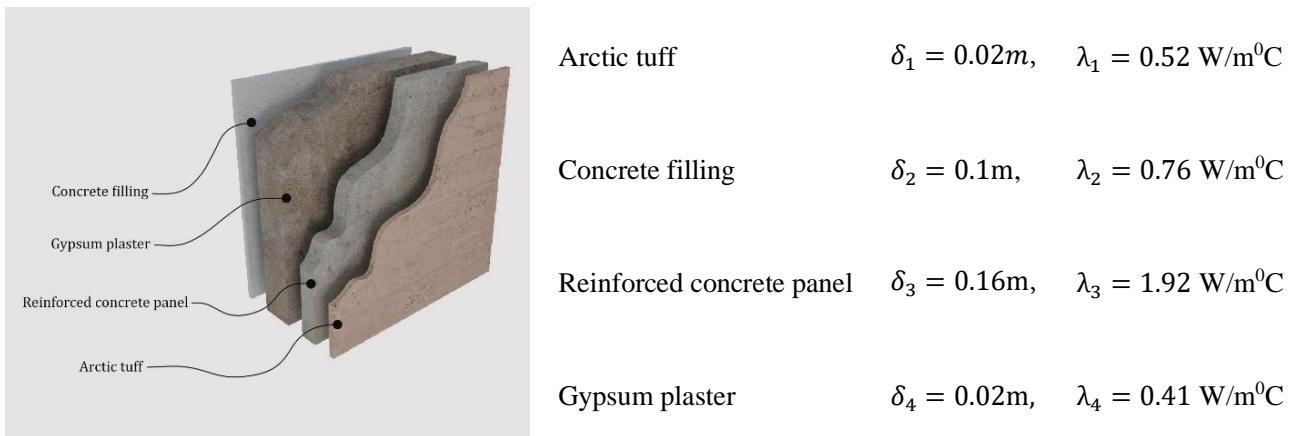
9 floor enclosing structure of a multi-story residential building
